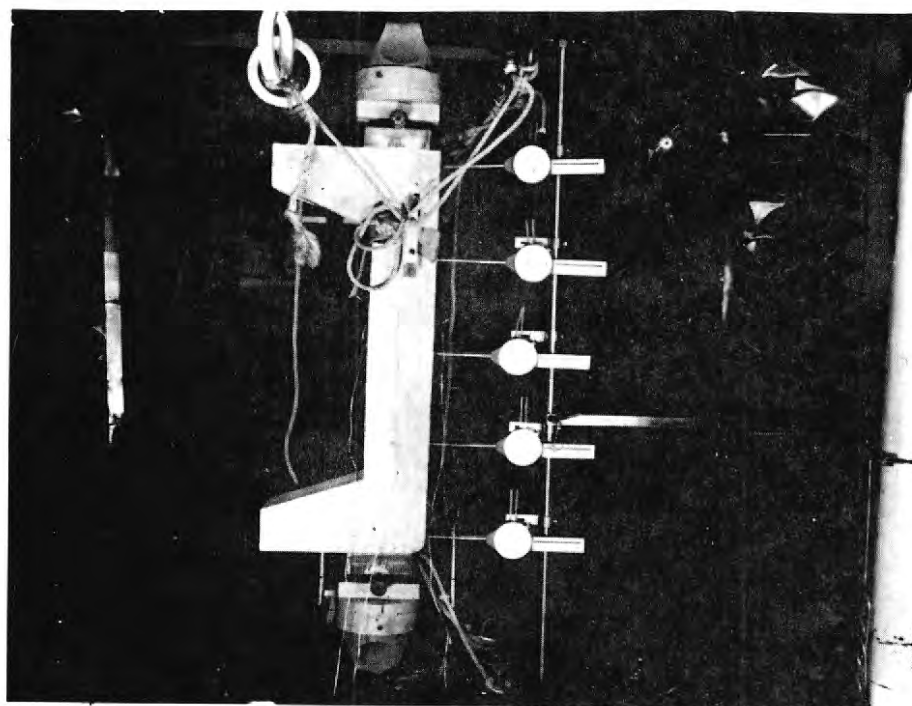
VIEW OF BEAM-COLUMN UNDER LOAD
